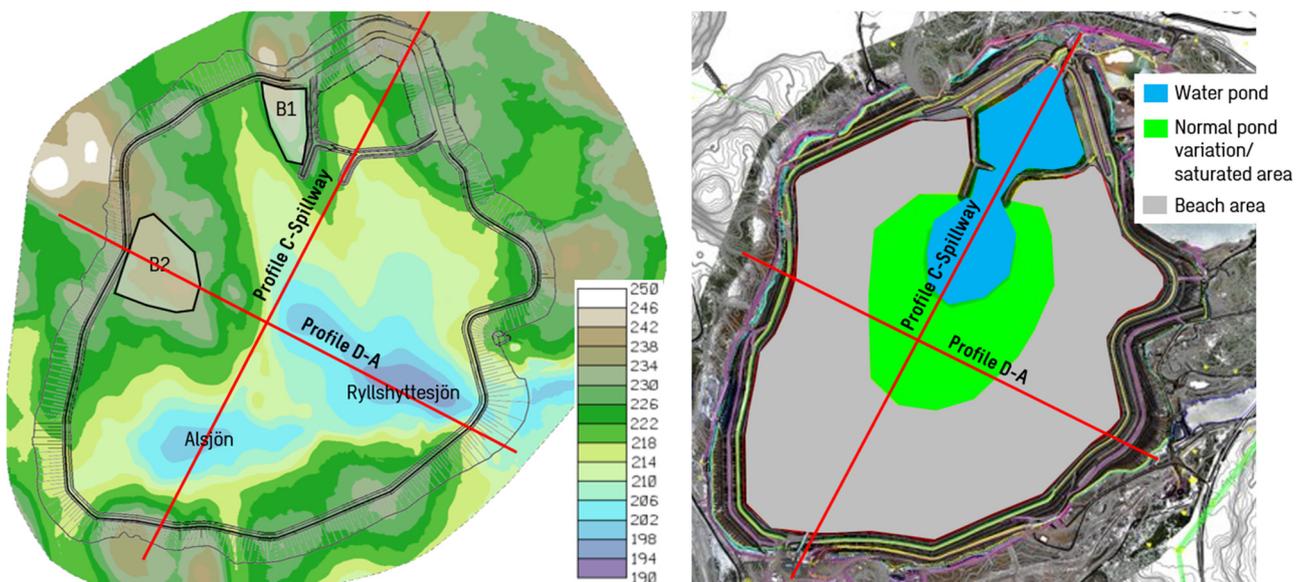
(a) Overview plan – topography before deposition with analysed sections (B1 and B2 refer to old rock quarries); (b) Overview plan – estimated final shape of tailings storage facility with analysed sections and location of water pond
